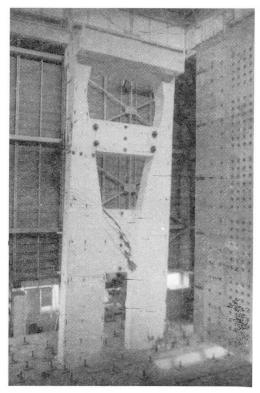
1/10 Model Test in Direction at Right Angles to Bridge Axis
